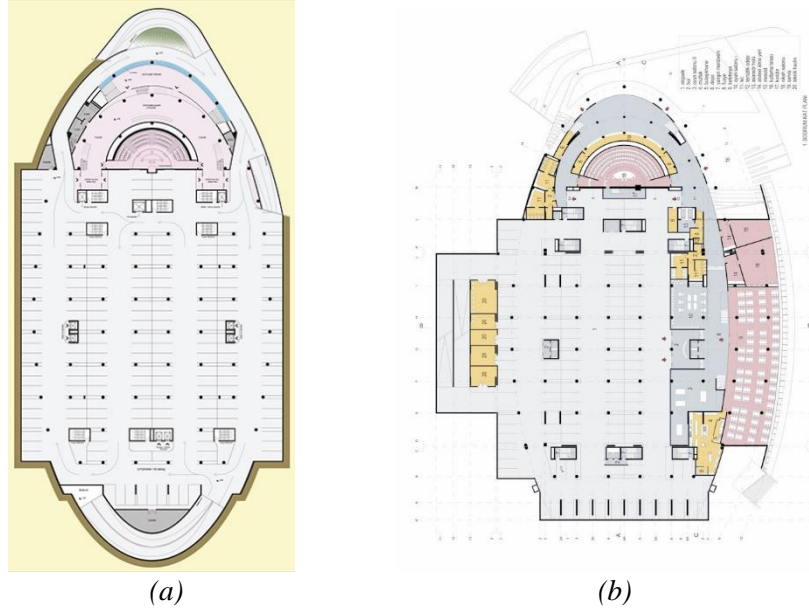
Underground floor plan of the concept design (a) and implementation project (b) [8]
